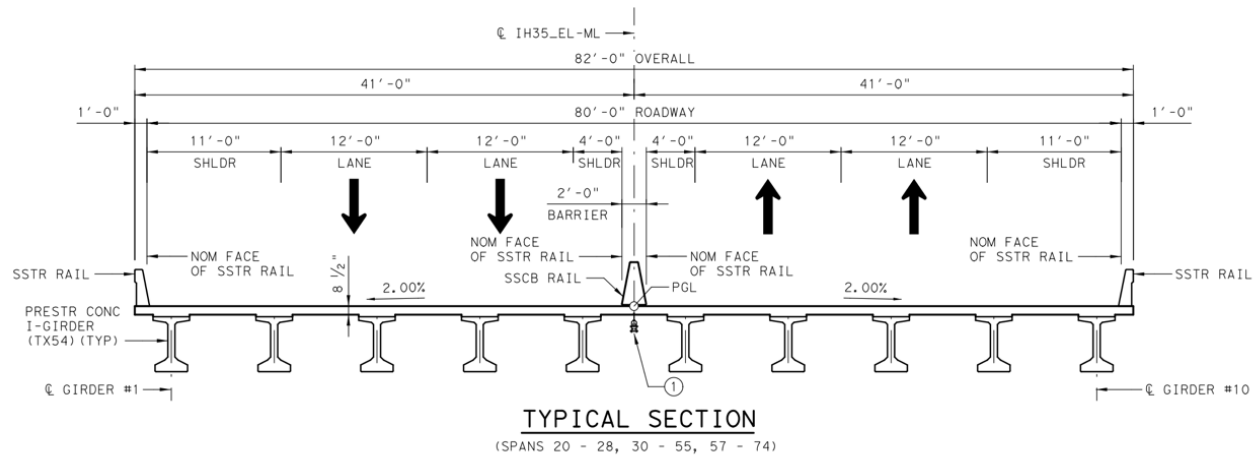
Typical Section Example from Highway Project Plans (TxDOT, 2022d)
